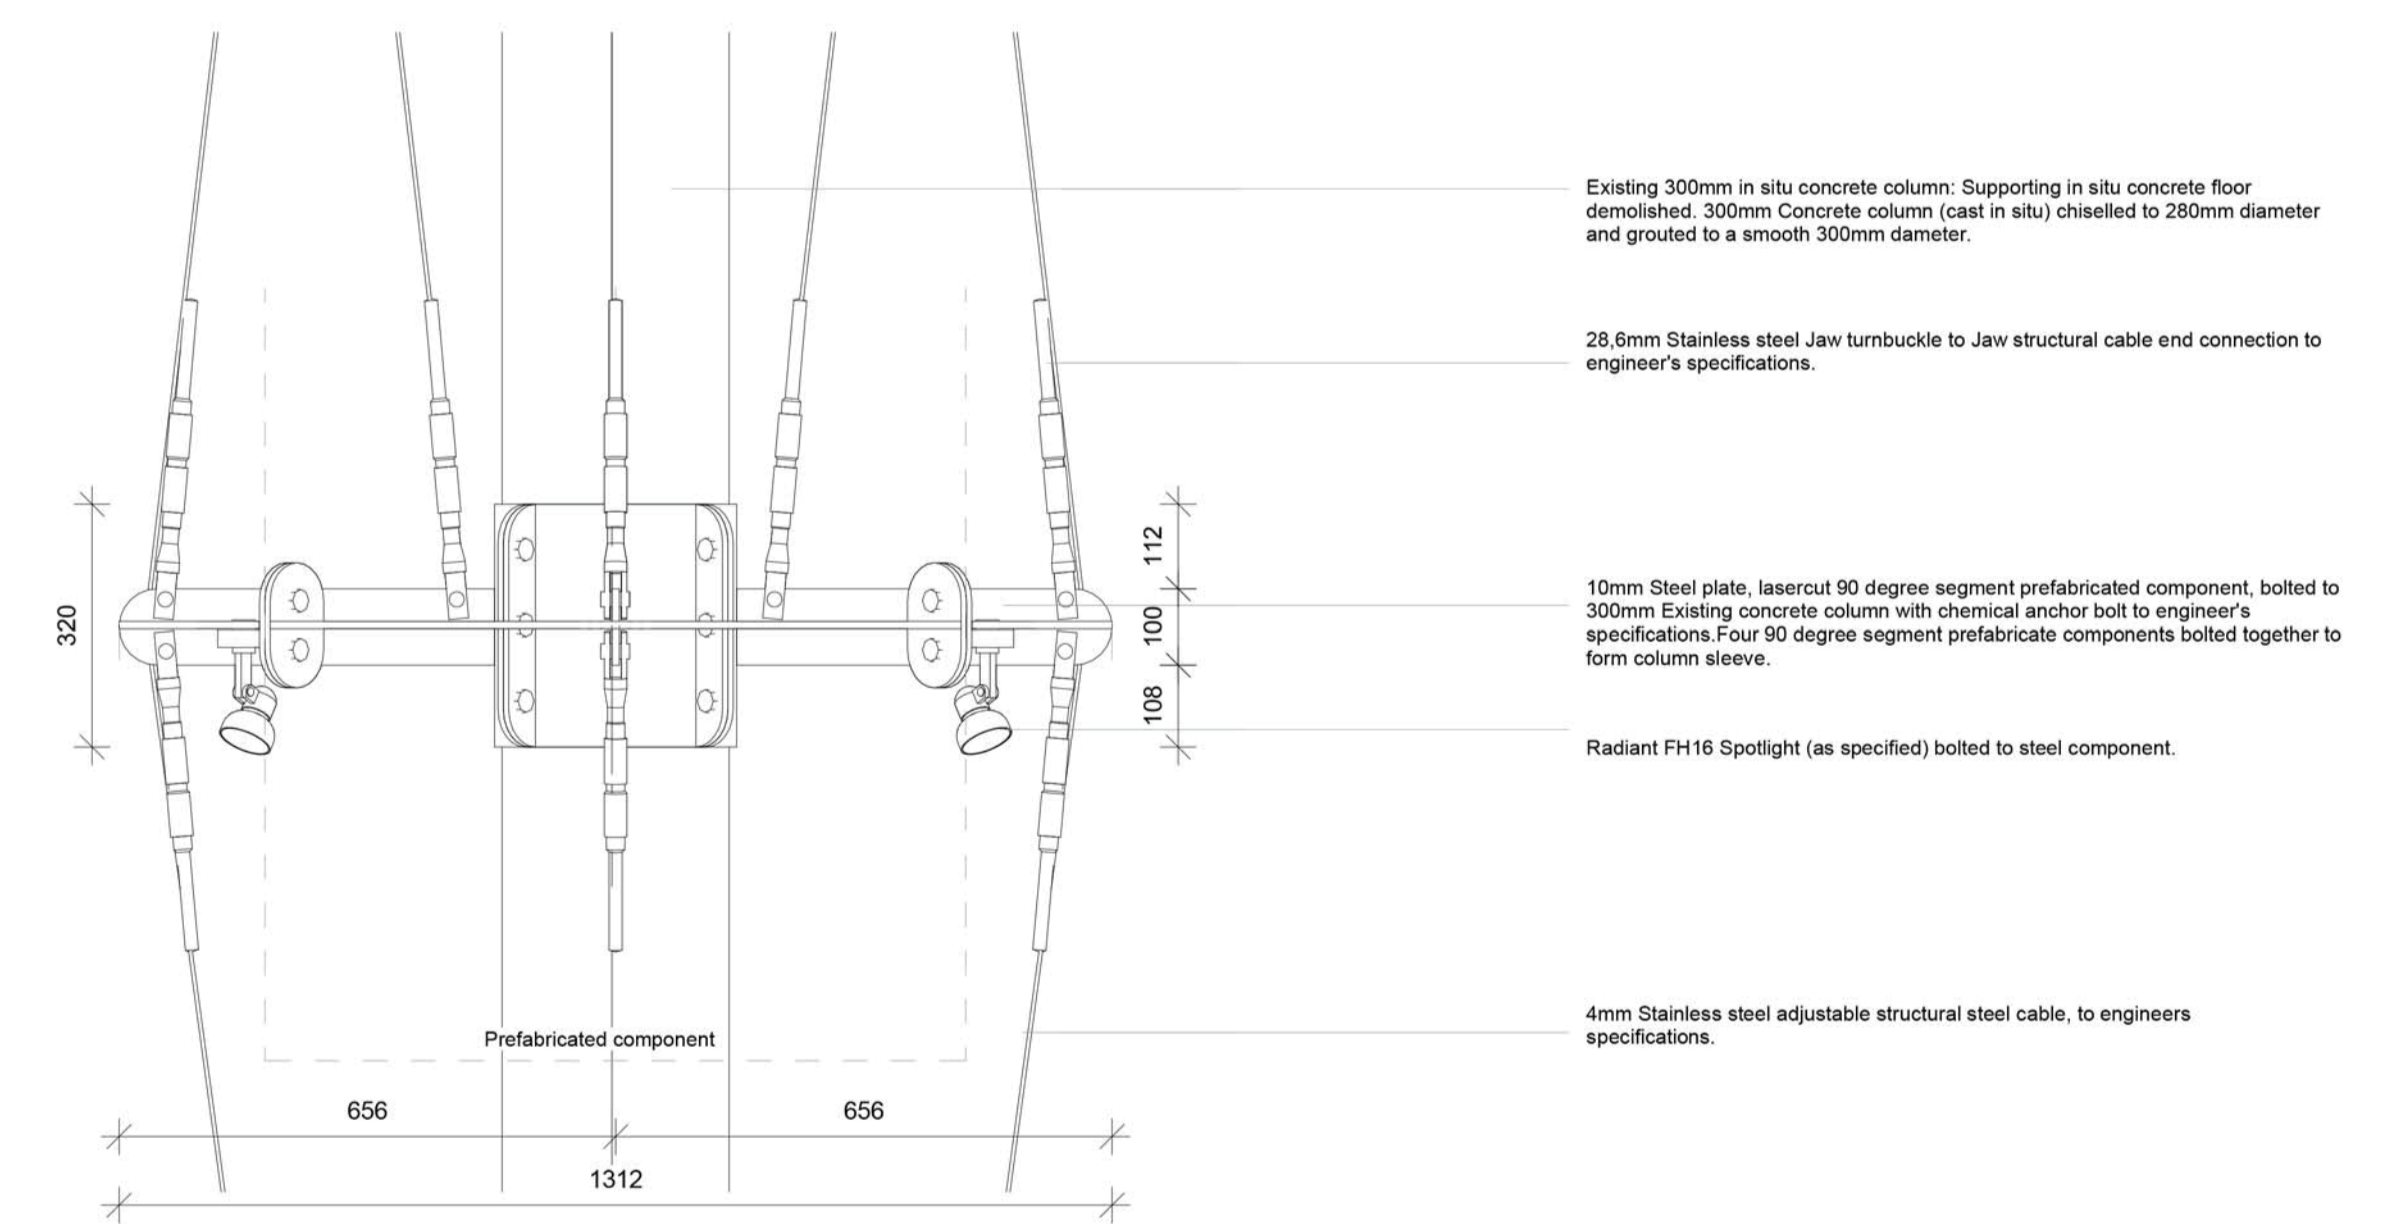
STRUCTURAL CABLE COLUMN SUPPORT DETAIL (ELEVATION) SCALE 1:10
